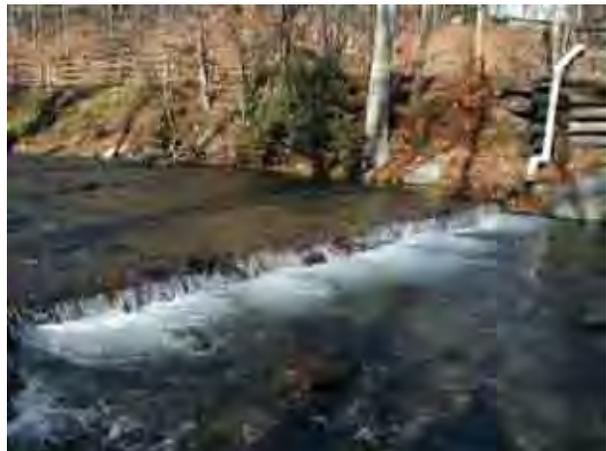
Just below Covered Bridge MU5, Wood Weir serving dry hydrant in downstream MU (see MU6 for more detail).
